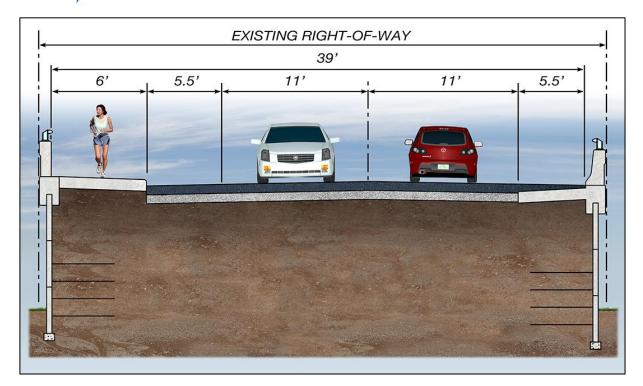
Proposed Roadway Section East of Proposed Fixed Bridge
